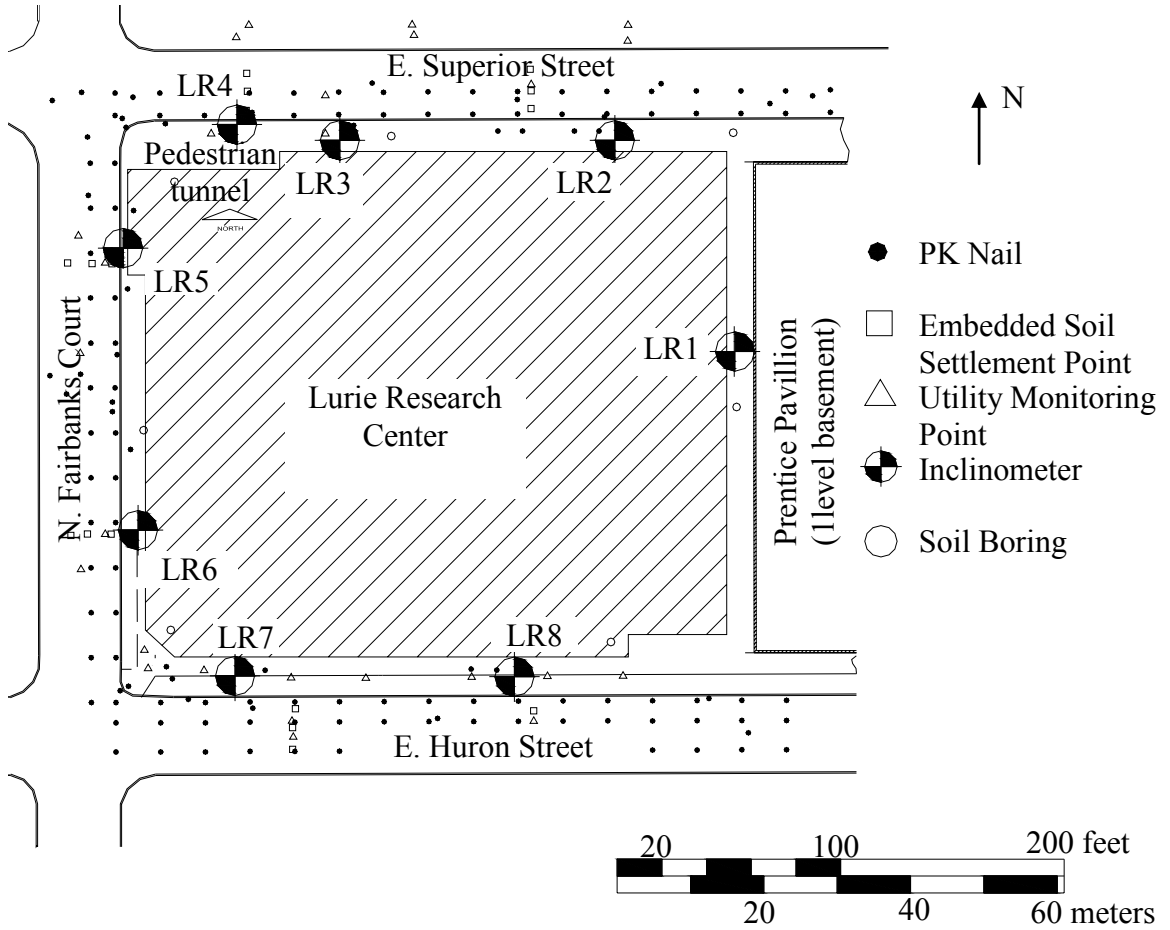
Plan view and instrument locations of Lurie Center excavation
